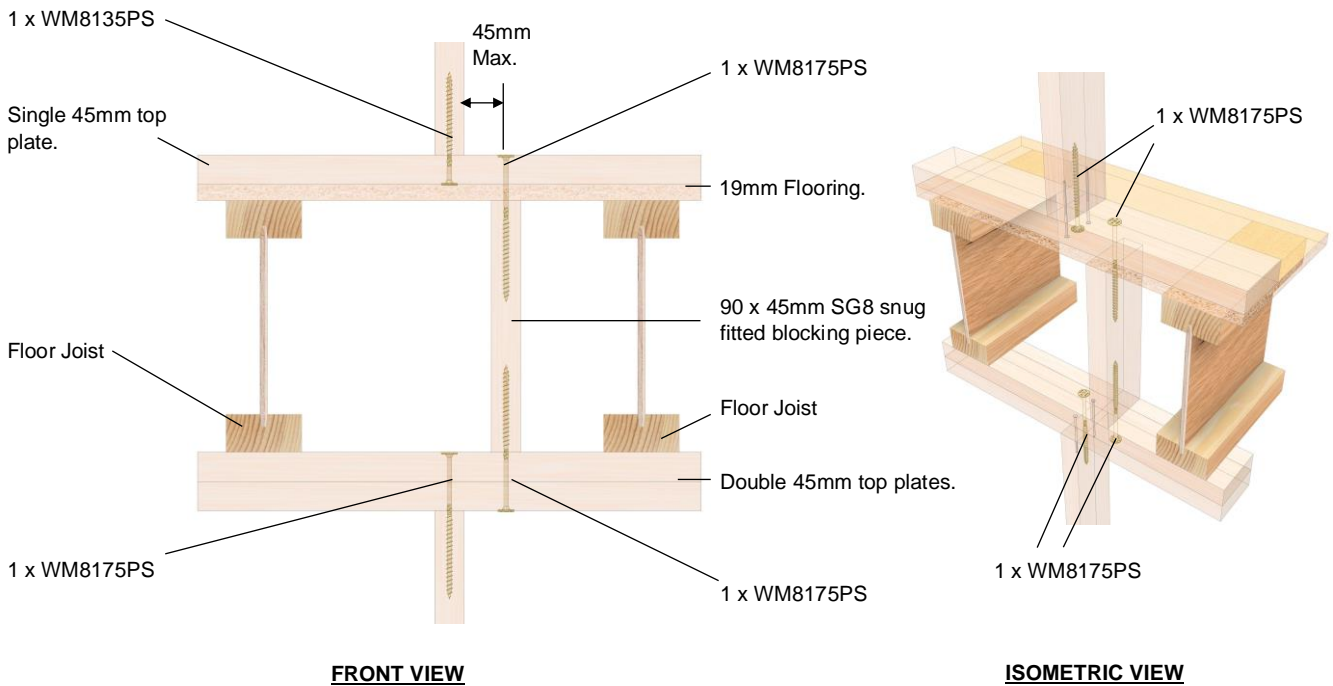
BETWEEN FLOOR JOISTS – CONTINUITY BLOCKING
